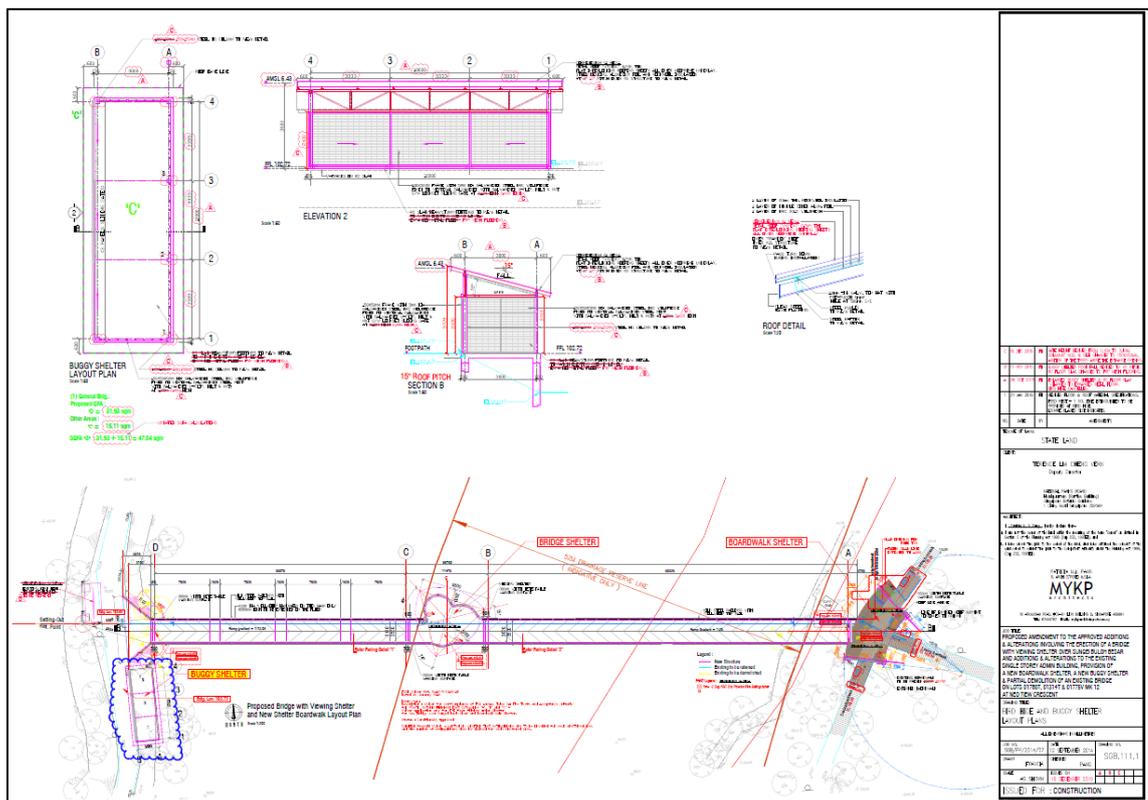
Buggy Shelter layout plan (indicated by blue cloud lines)
